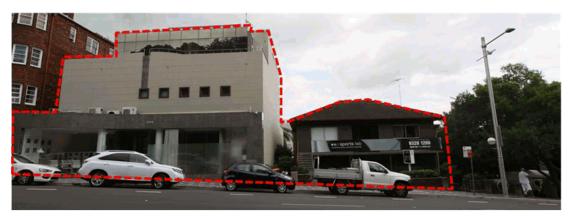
Subject site, New South Head Road frontage (Source: Tzannes)
